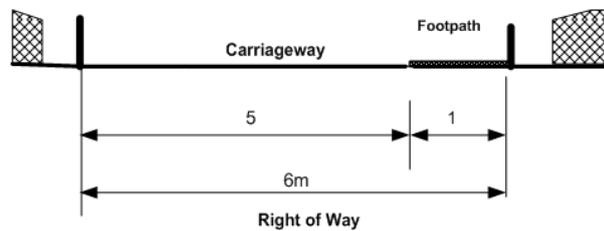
Proposed cross section of NGO Road (Class D) for right of way
